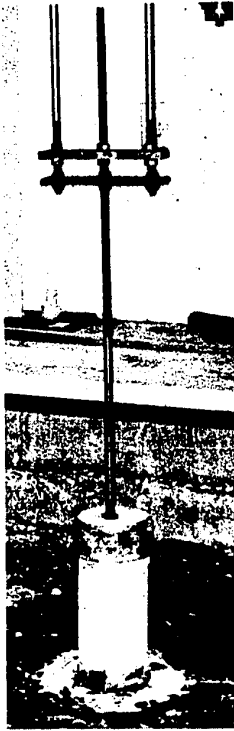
SUSPENSION ARRANGEMENT USED FOR PILES A & E (UNSUPPORTED AT BOTTOM).
